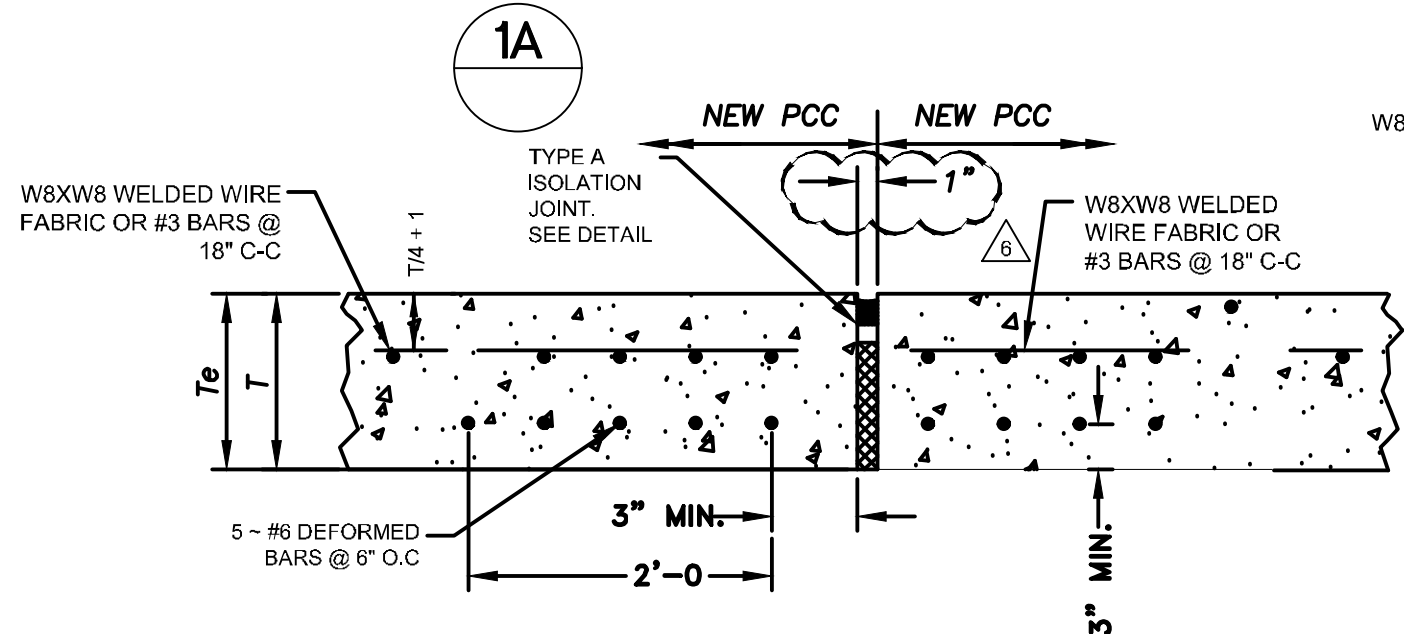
DETAILS OF JOINT SEALS IN PCC PAVEMENT
